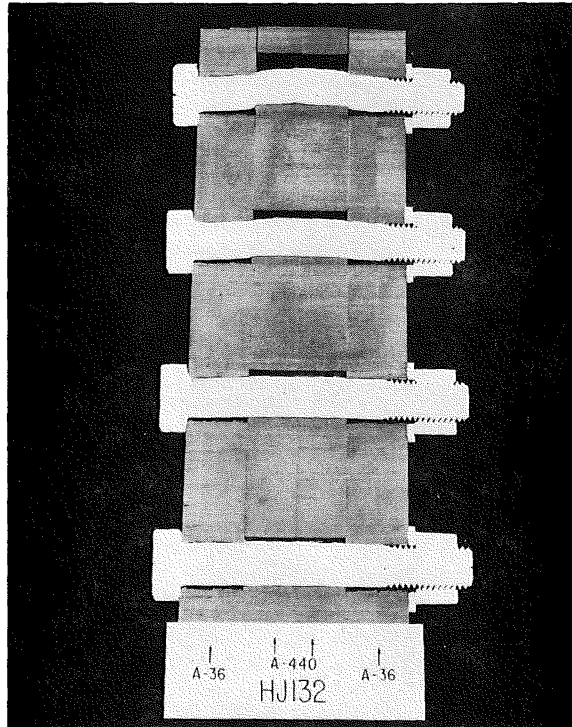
Section of Joint HJ132 Showing Bolt and Plate Deformations after Failure (Main Plate End)
